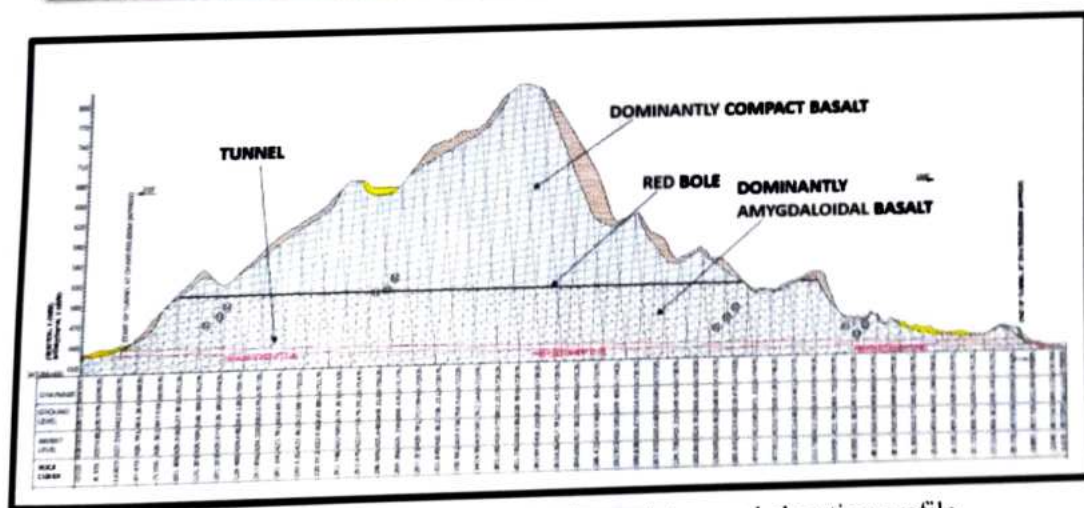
&5 :- Proposed Tunnel look like above picture and elevation profile
